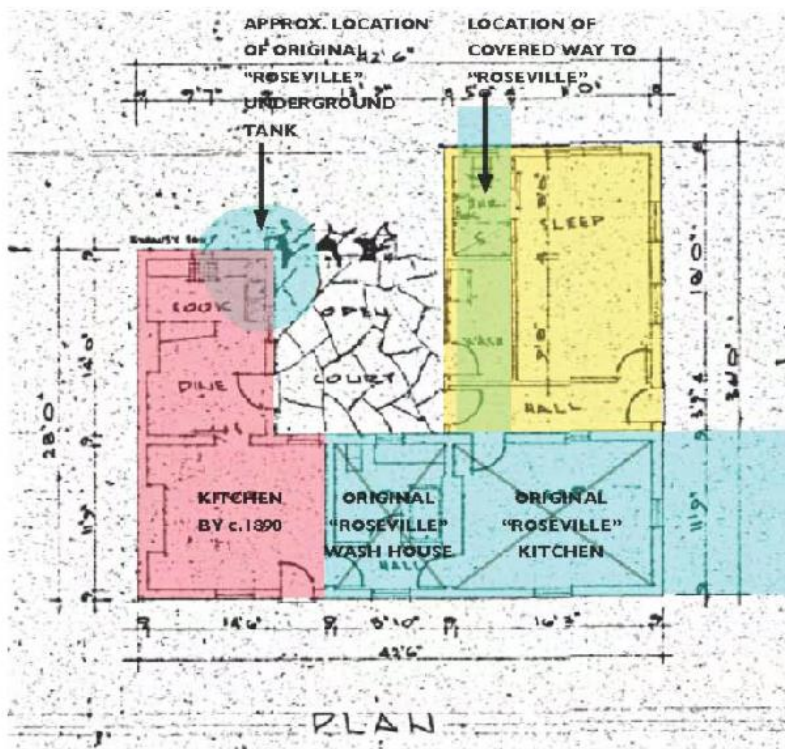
No. 21 Whistler Street as depicted in the 1967 plans for alterations and additions to the building. Blue = structures constructed by Thomas Rowe as a part of "Roseville" as shown on the 1883 auction notice at Figure 4.1, Red = structures added by c.1890 as shown on the MWS&DB Manly Detail Sheet 29 and in the Kerry & Co photograph at Figure 4.2, Yellow = additions proposed in 1967.
